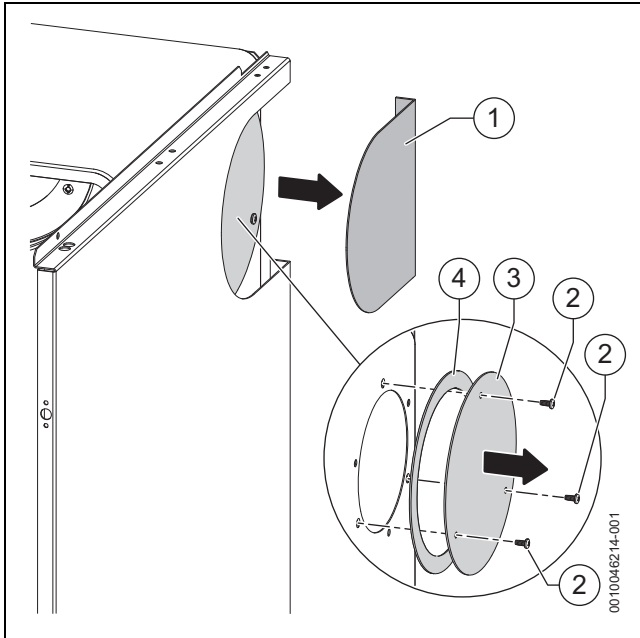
Removing knock-out panel and flue outlet blanking plate (right hand side example)
